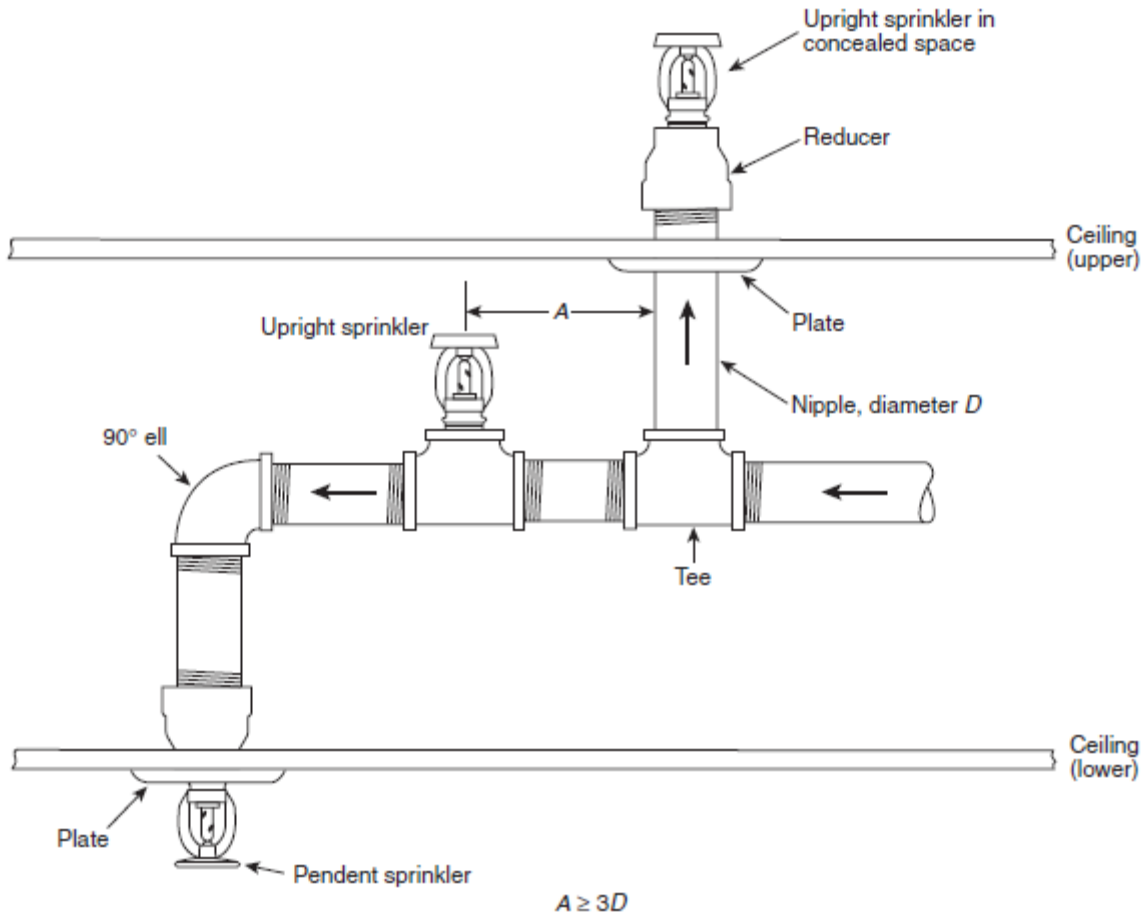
(c) Arrangement of Branch Lines Supplying Sprinklers Above, in Between, and Below Ceilings.
